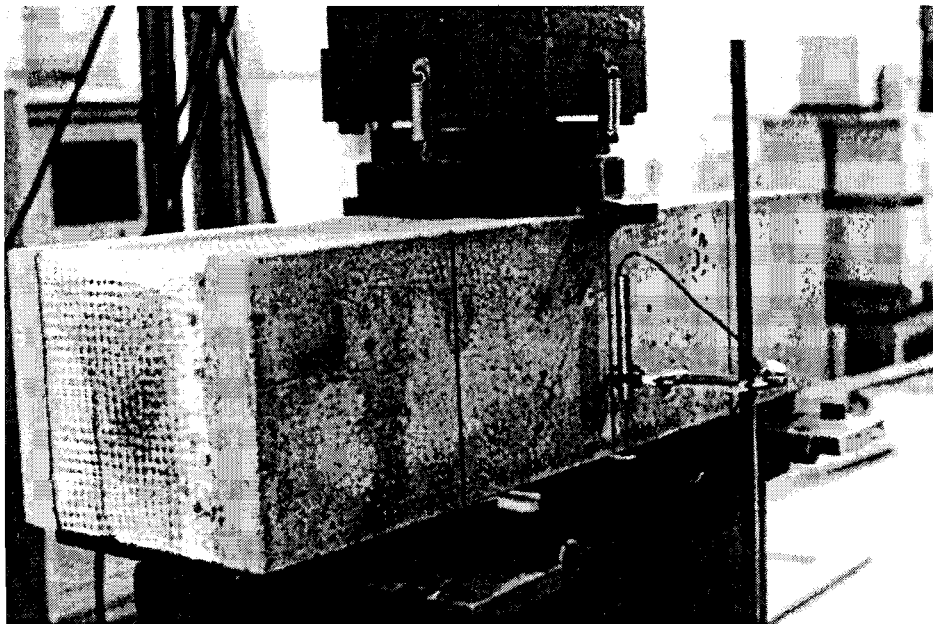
Setup for 3-point bending tests with skins perpendicular to base
